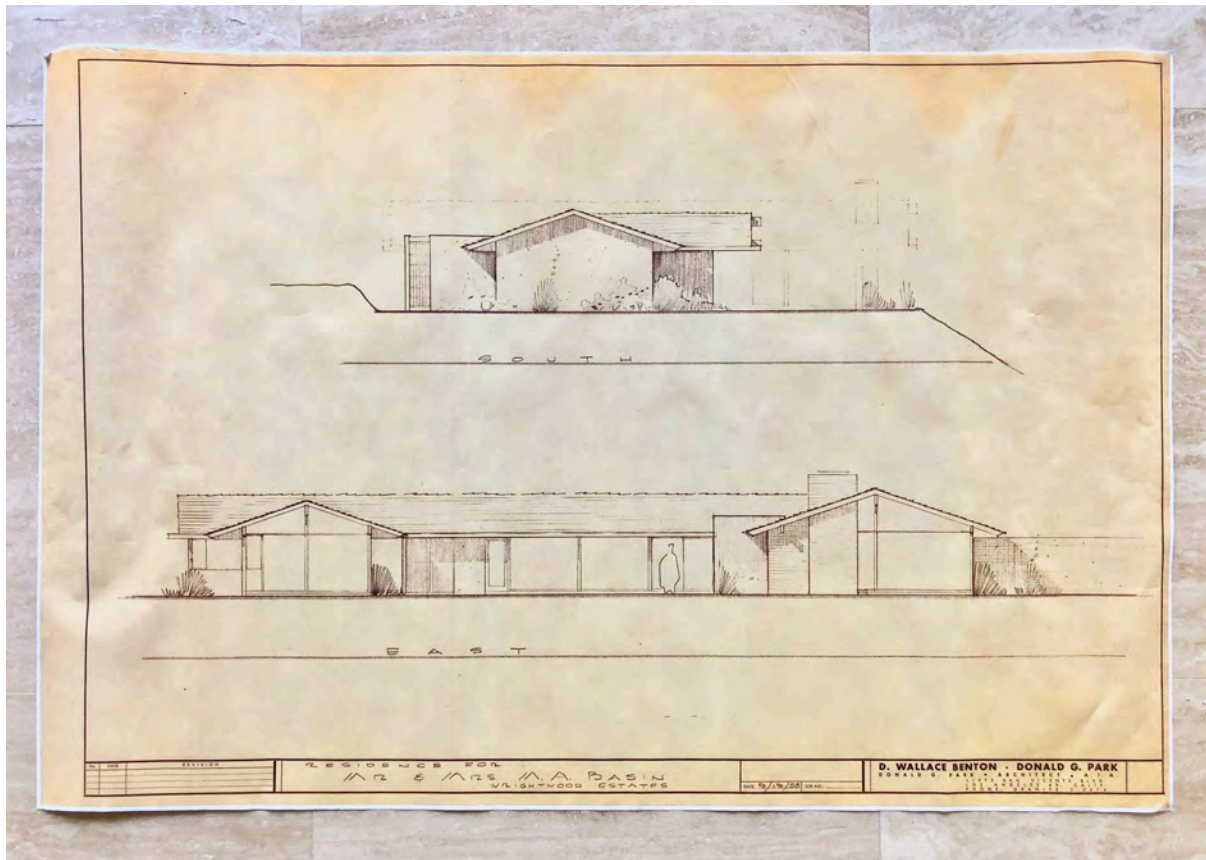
Benton and Park Architects. Basin Residence, south and east elevations, 1958.
